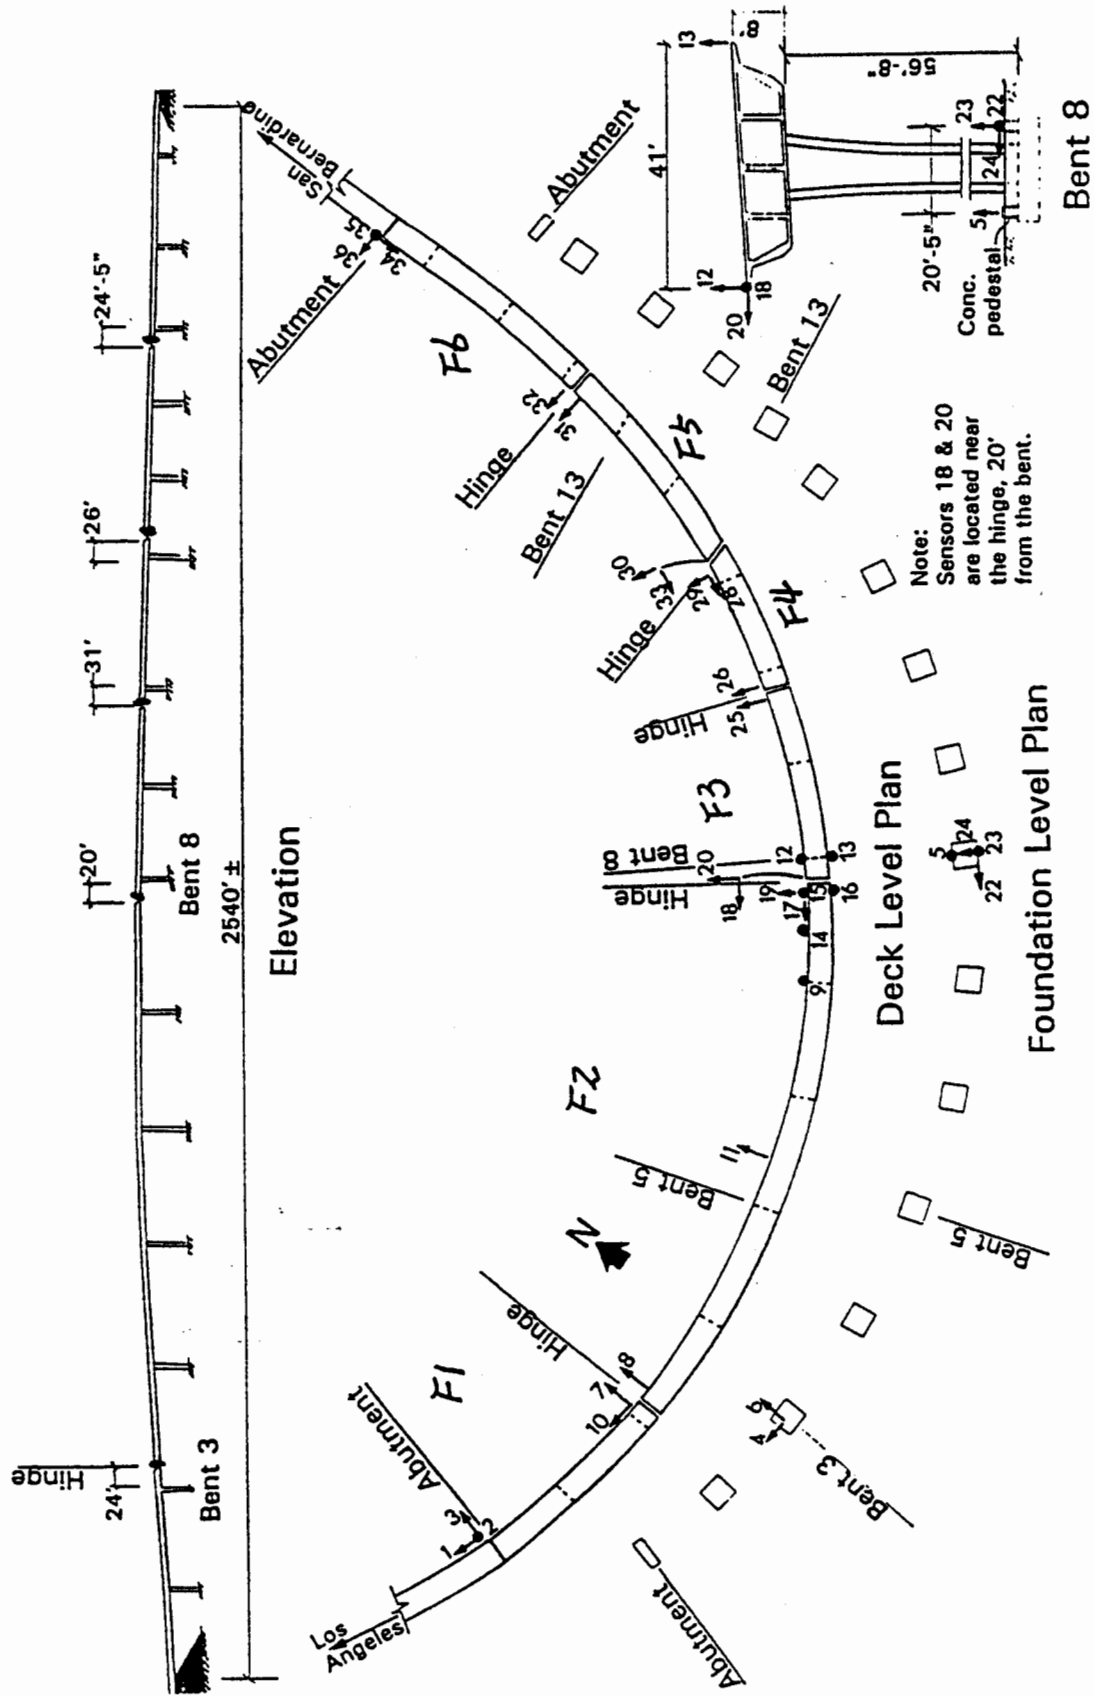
Plan, Elevation and Instrumentation Locations of the NW Connector in the I10/215 Interchange
